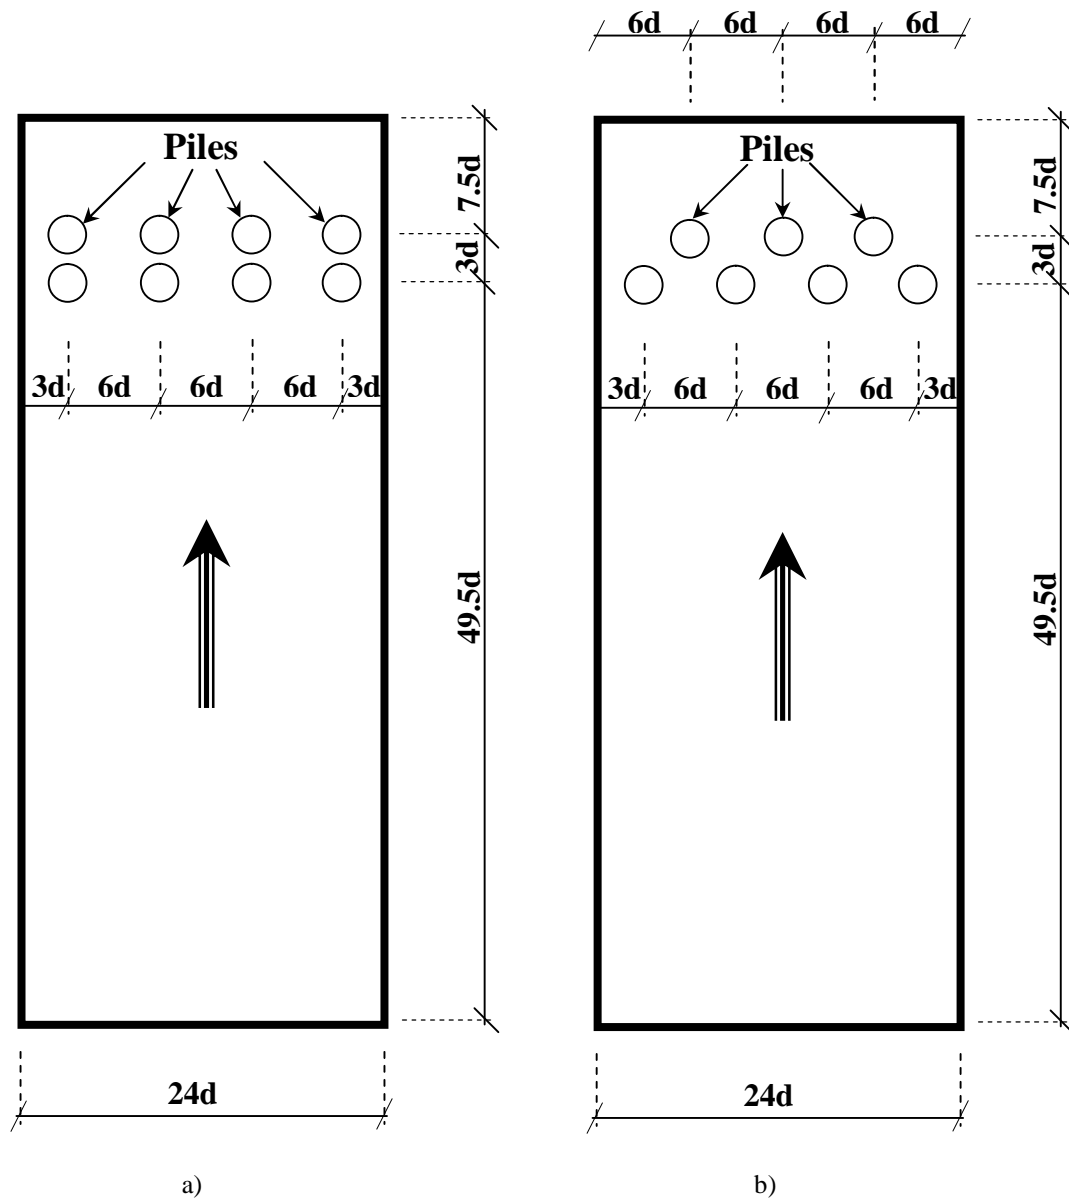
Pile arrangements for two rows of piles: a) Parallel arrangement b) Zigzag arrangement
